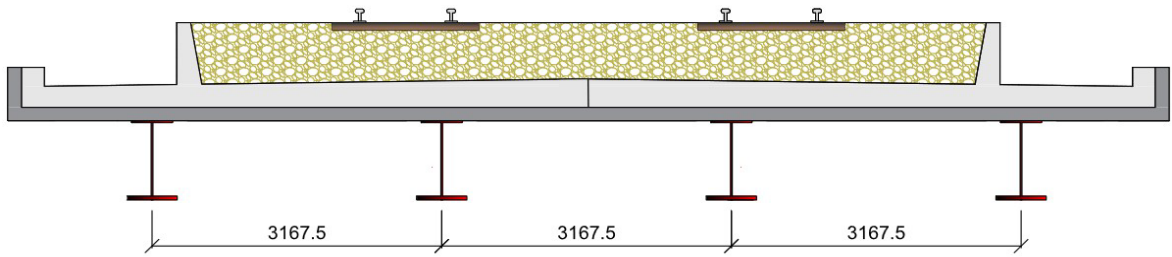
TRA-S20-LH15-W deck cross-section (dimensions in mm).
